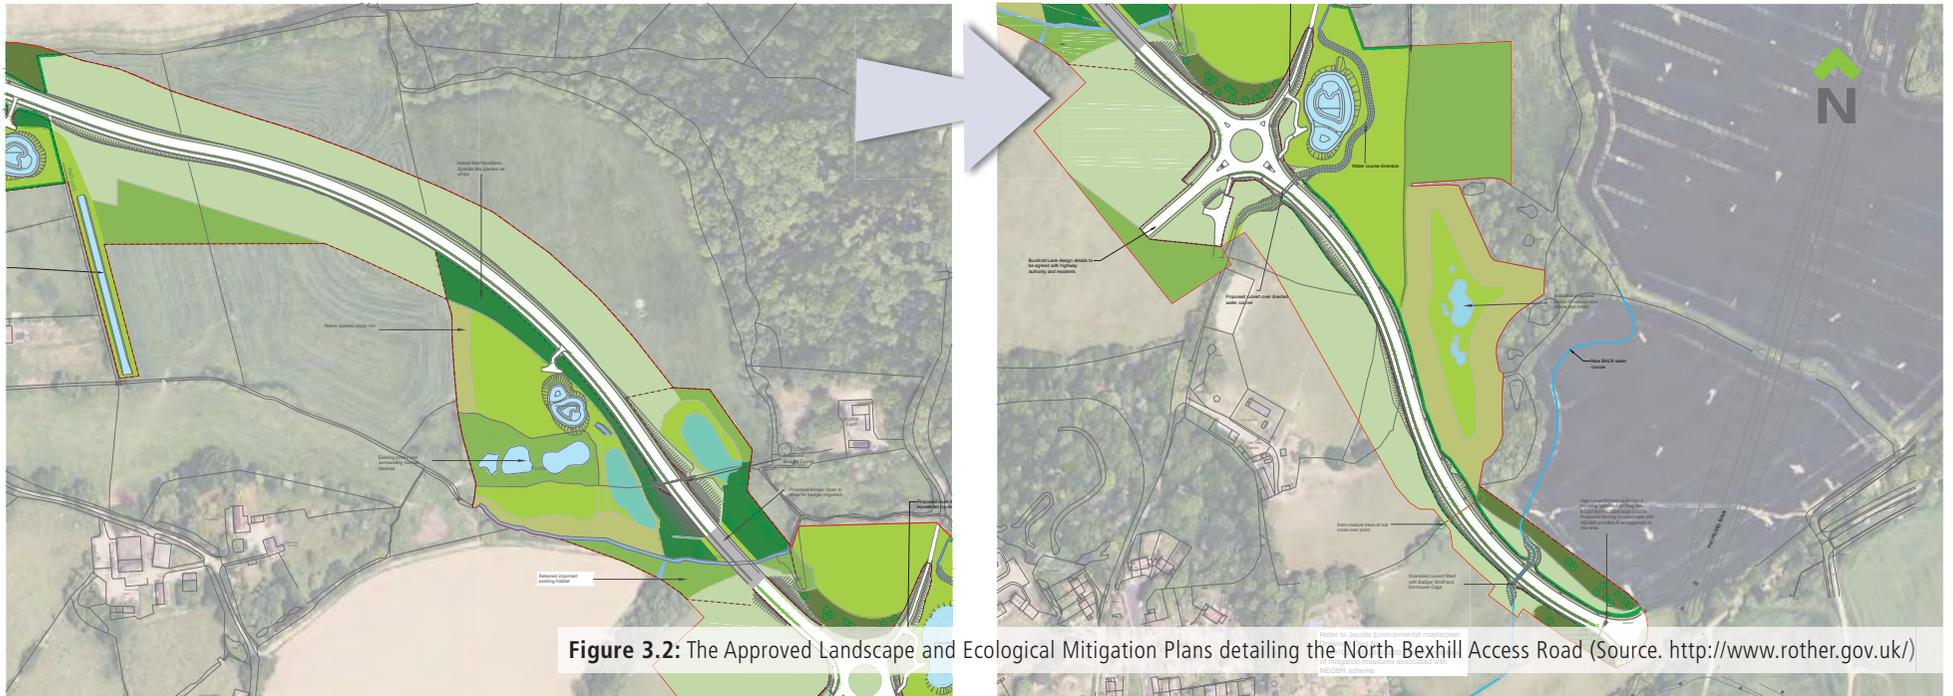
The Approved Landscape and Ecological Mitigation Plans detailing the North Bexhill Access Road (Source: <http://www.rother.gov.uk/>)
